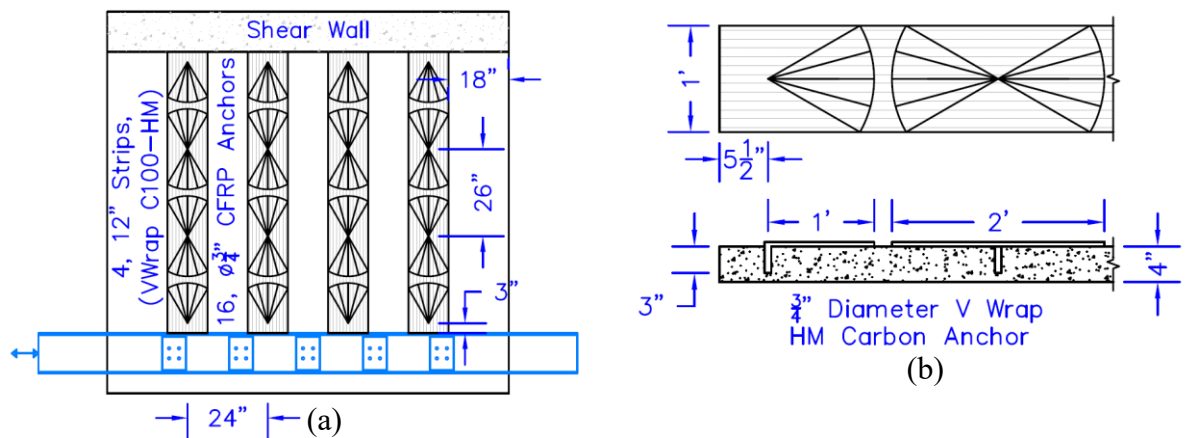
Retrofit of Specimen CD6: (a) Plan View of Retrofit (b) Anchor Details.
